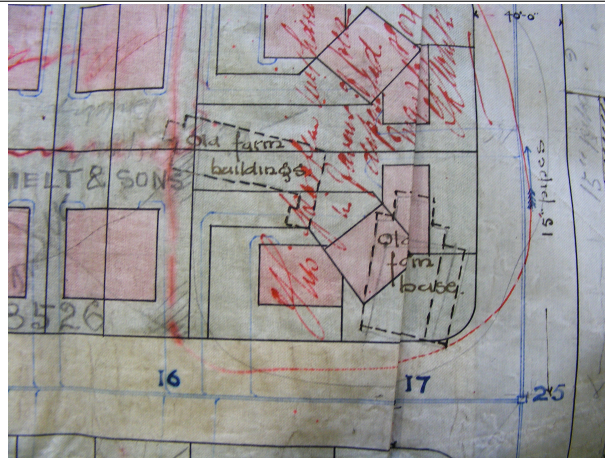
Plans of buildings of 'Heaton Town Farm', north side of Simonside terrace; Vendor's Plan T186-V228 from 1881.
